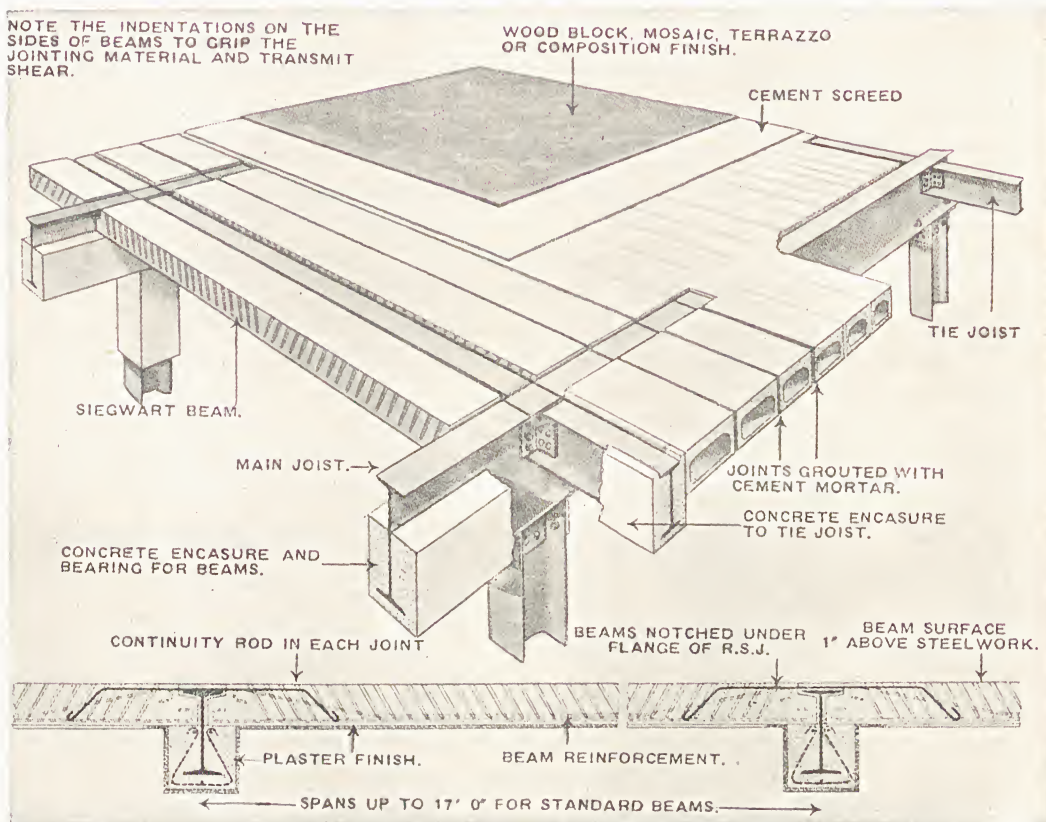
"Siegwart" fireproof floor. (By courtesy of the Siegwart Fireproof Floor Co., Ltd.)
